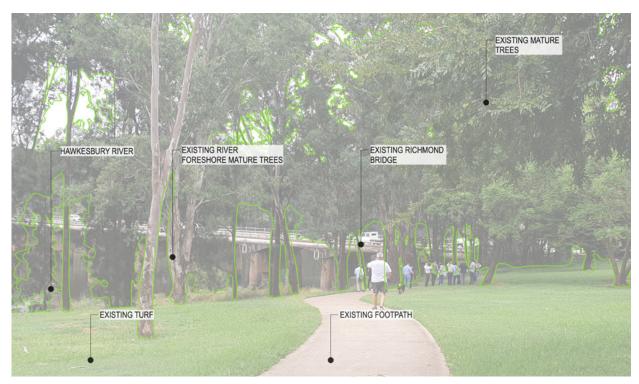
Viewpoint 2 - Existing view within Hanna Park facing south towards the Hawkesbury River
